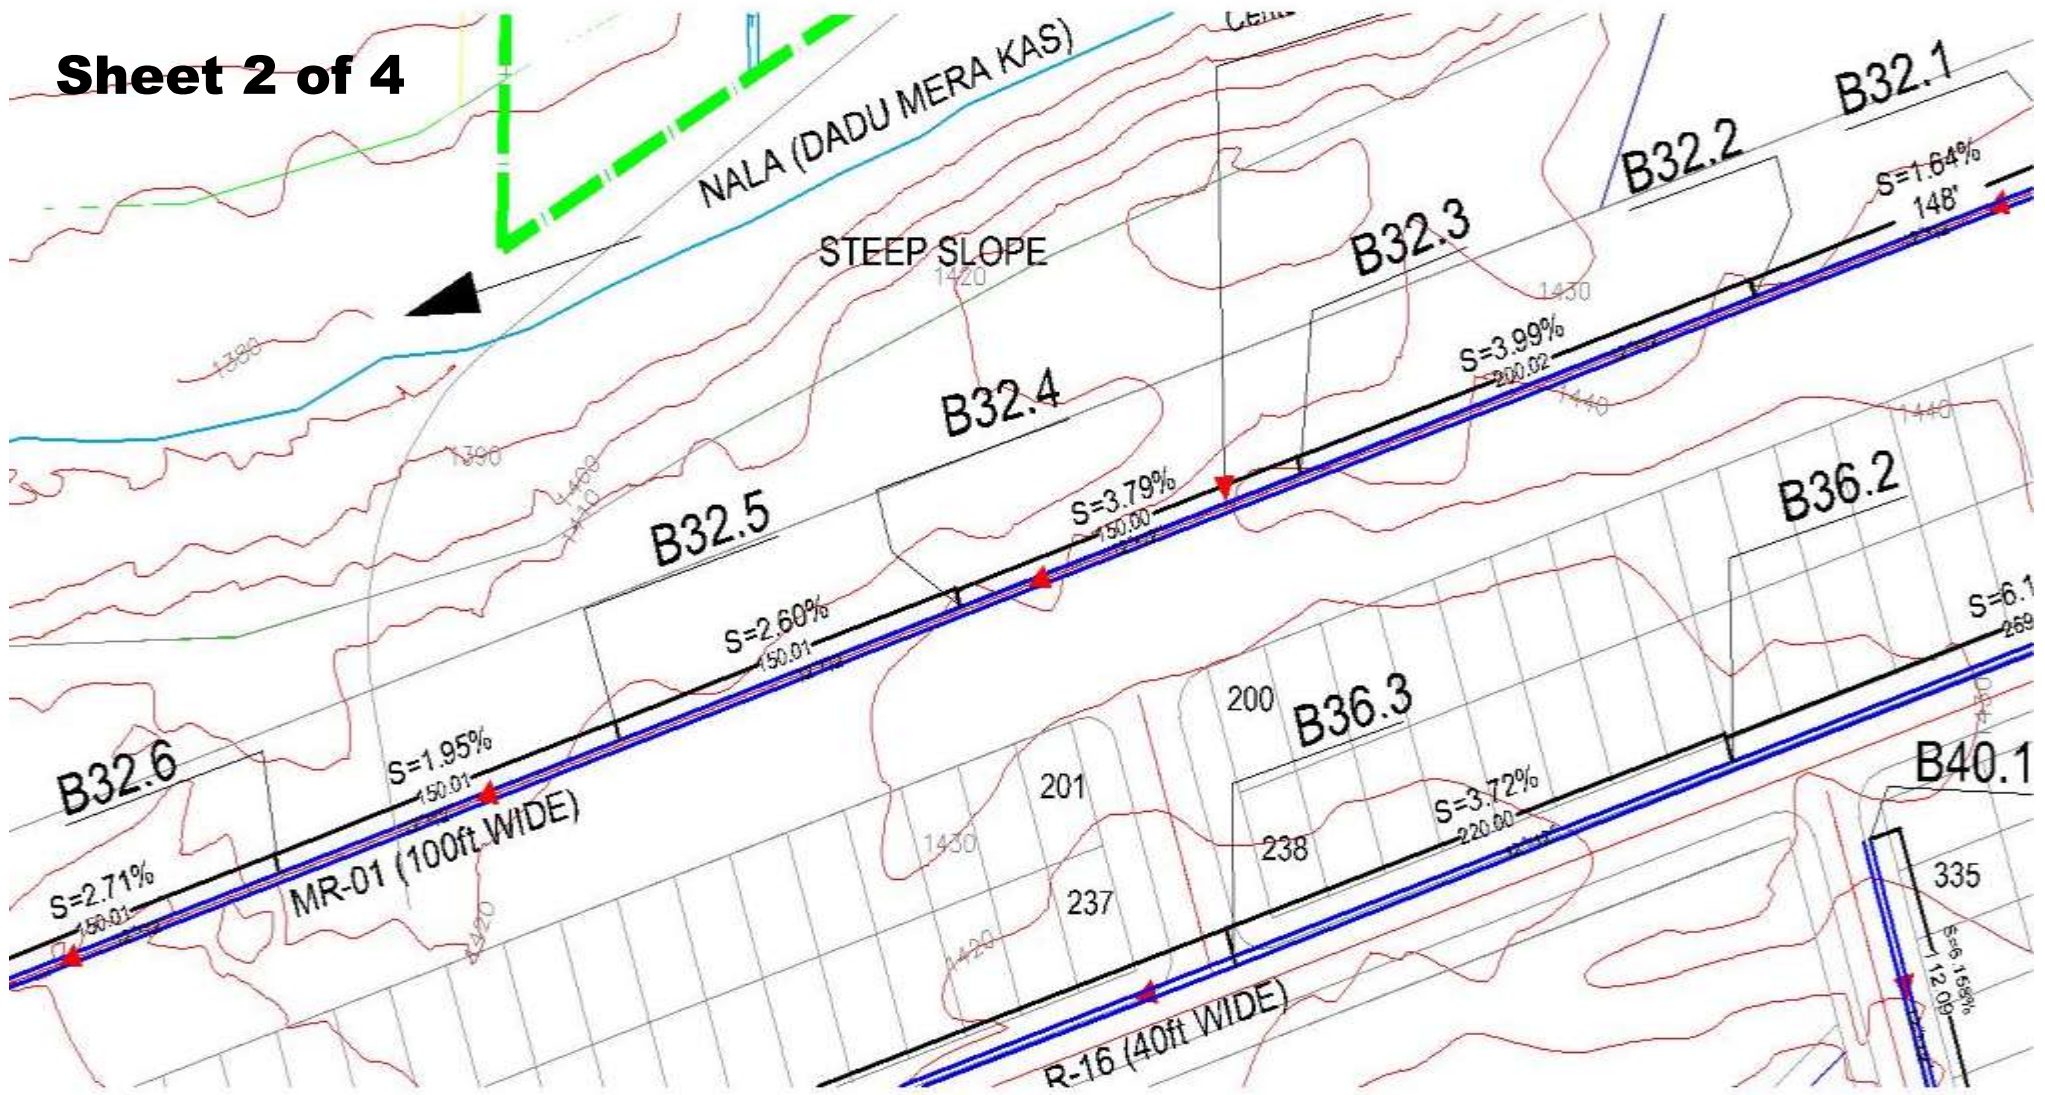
Storm drainage layout plan of Sub-catchment-5 part two
